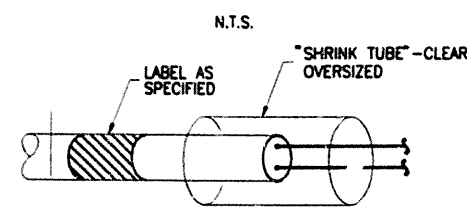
# DETAIL "B" - TYPICAL CABLE LABELING METHOD
